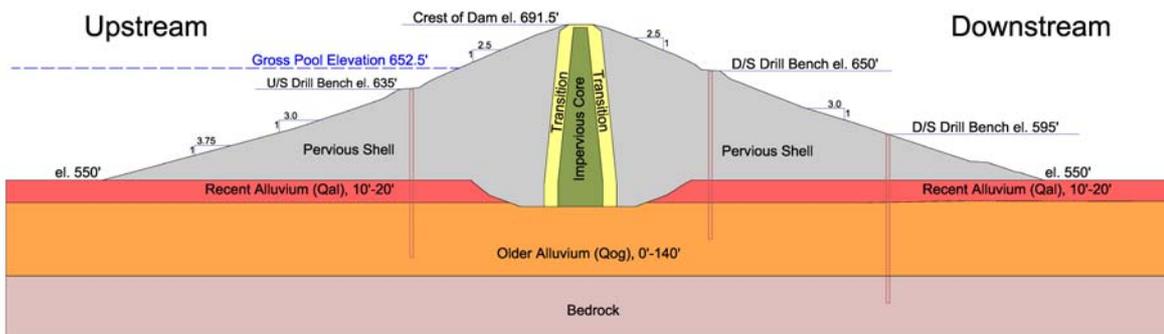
Typical Cross Section for Success Dam (Provided by the Sacramento District)
